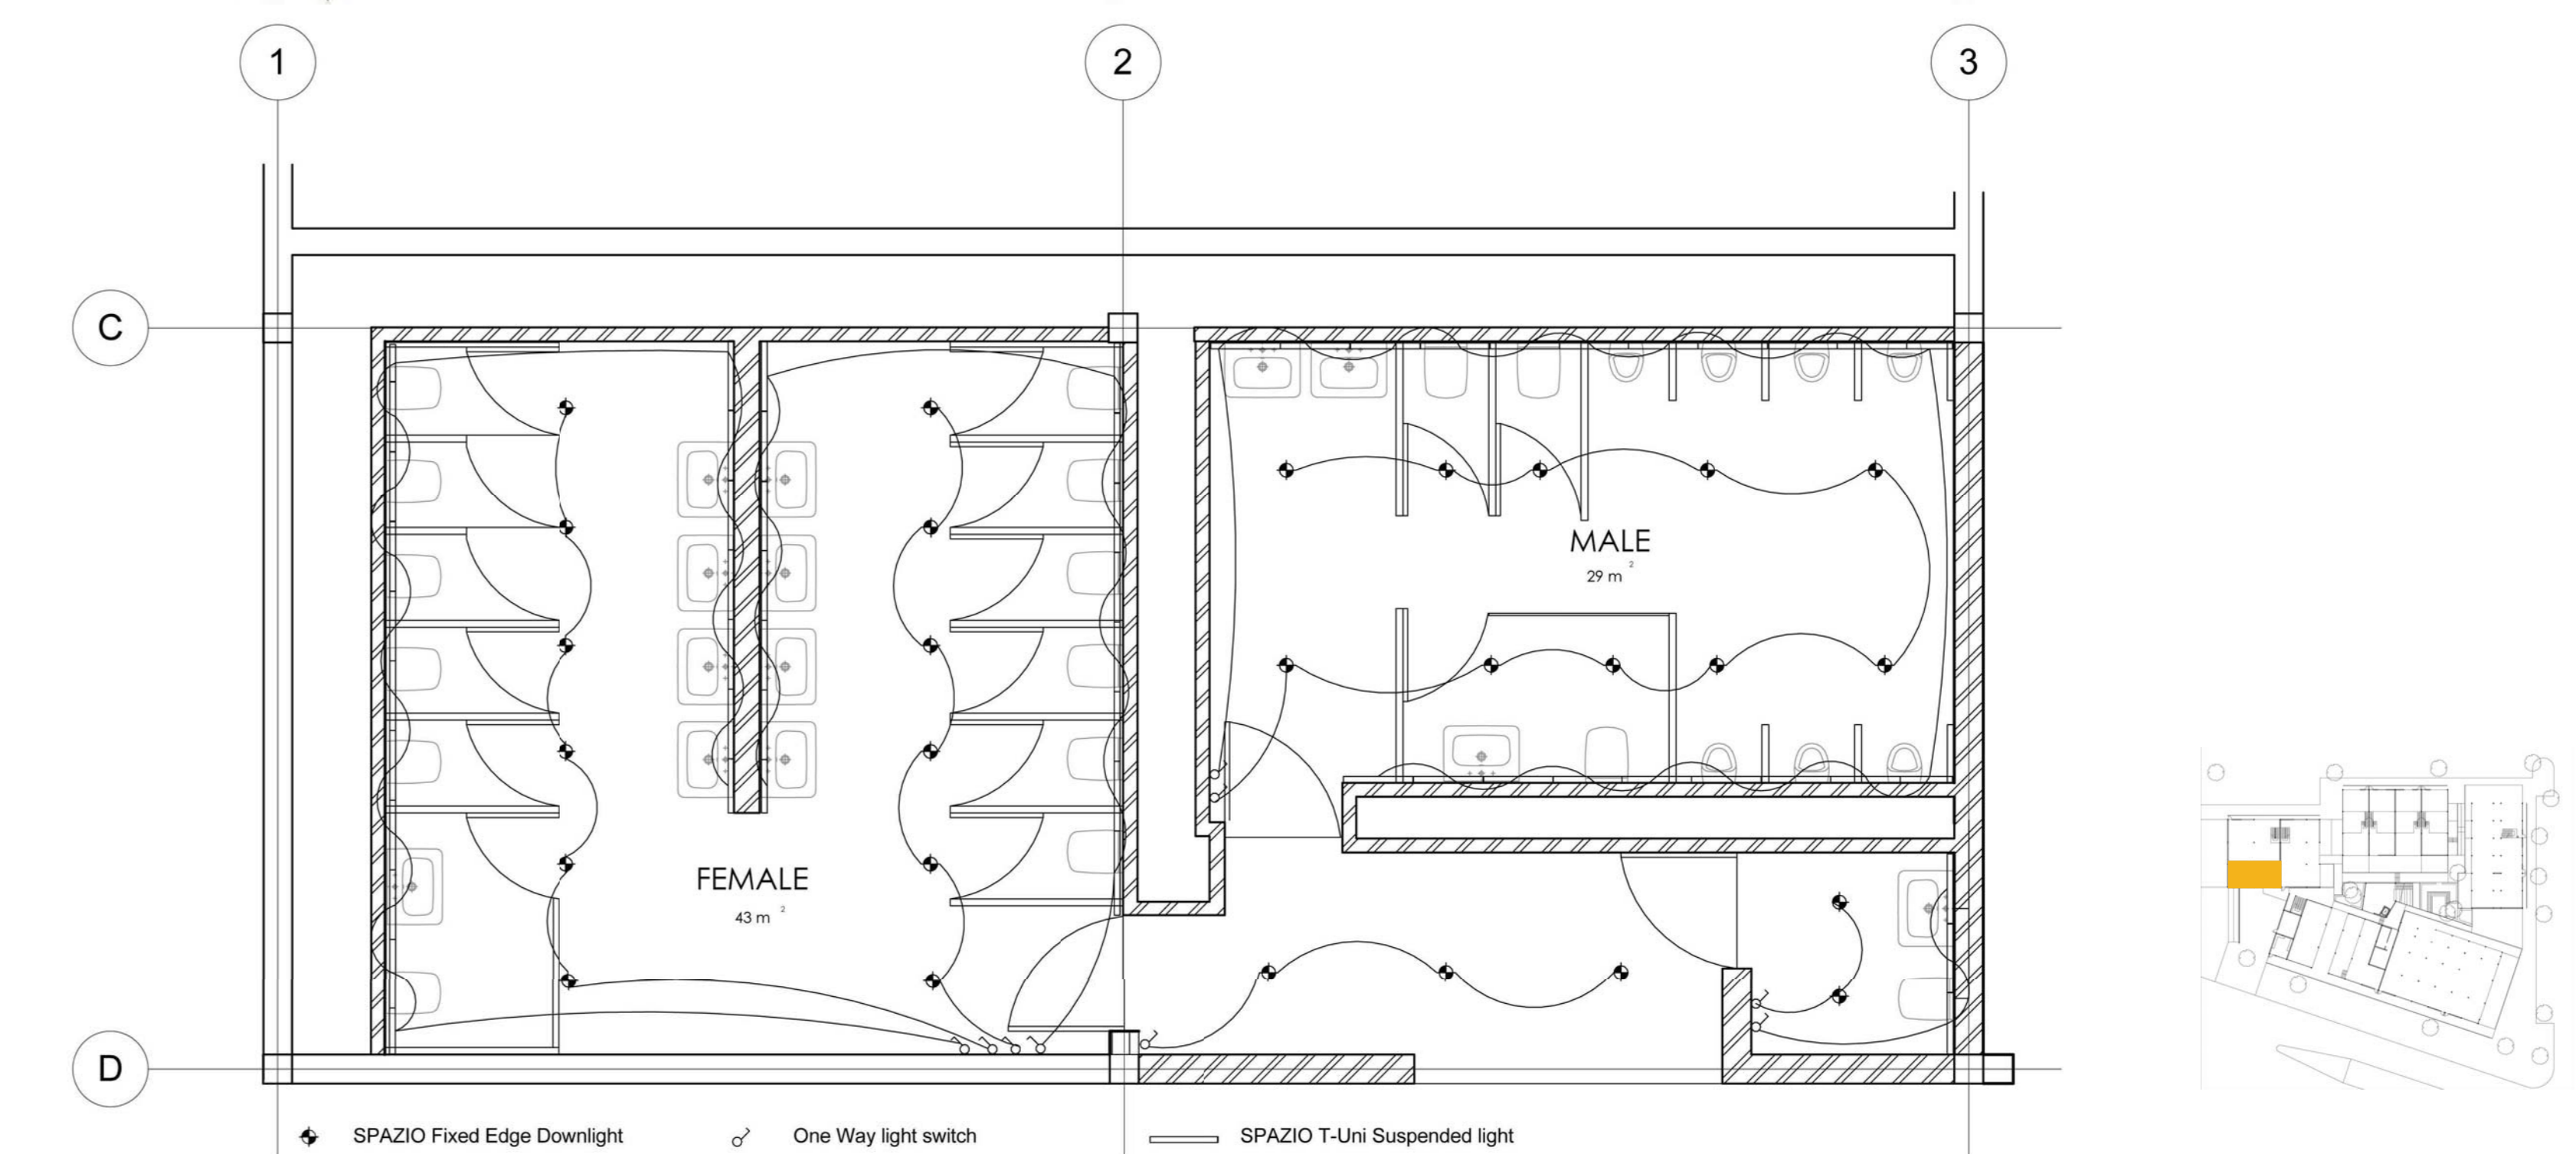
Ablution facilities lighting plan Scale 1:50
